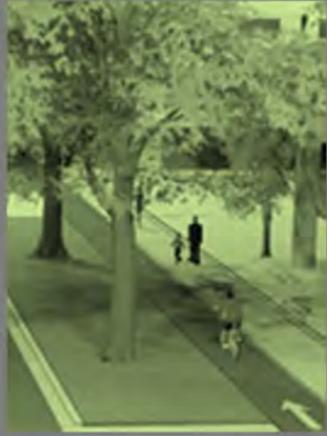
Typical Lay-By Parking Bay in-line with Furnishing and Planting Zone
